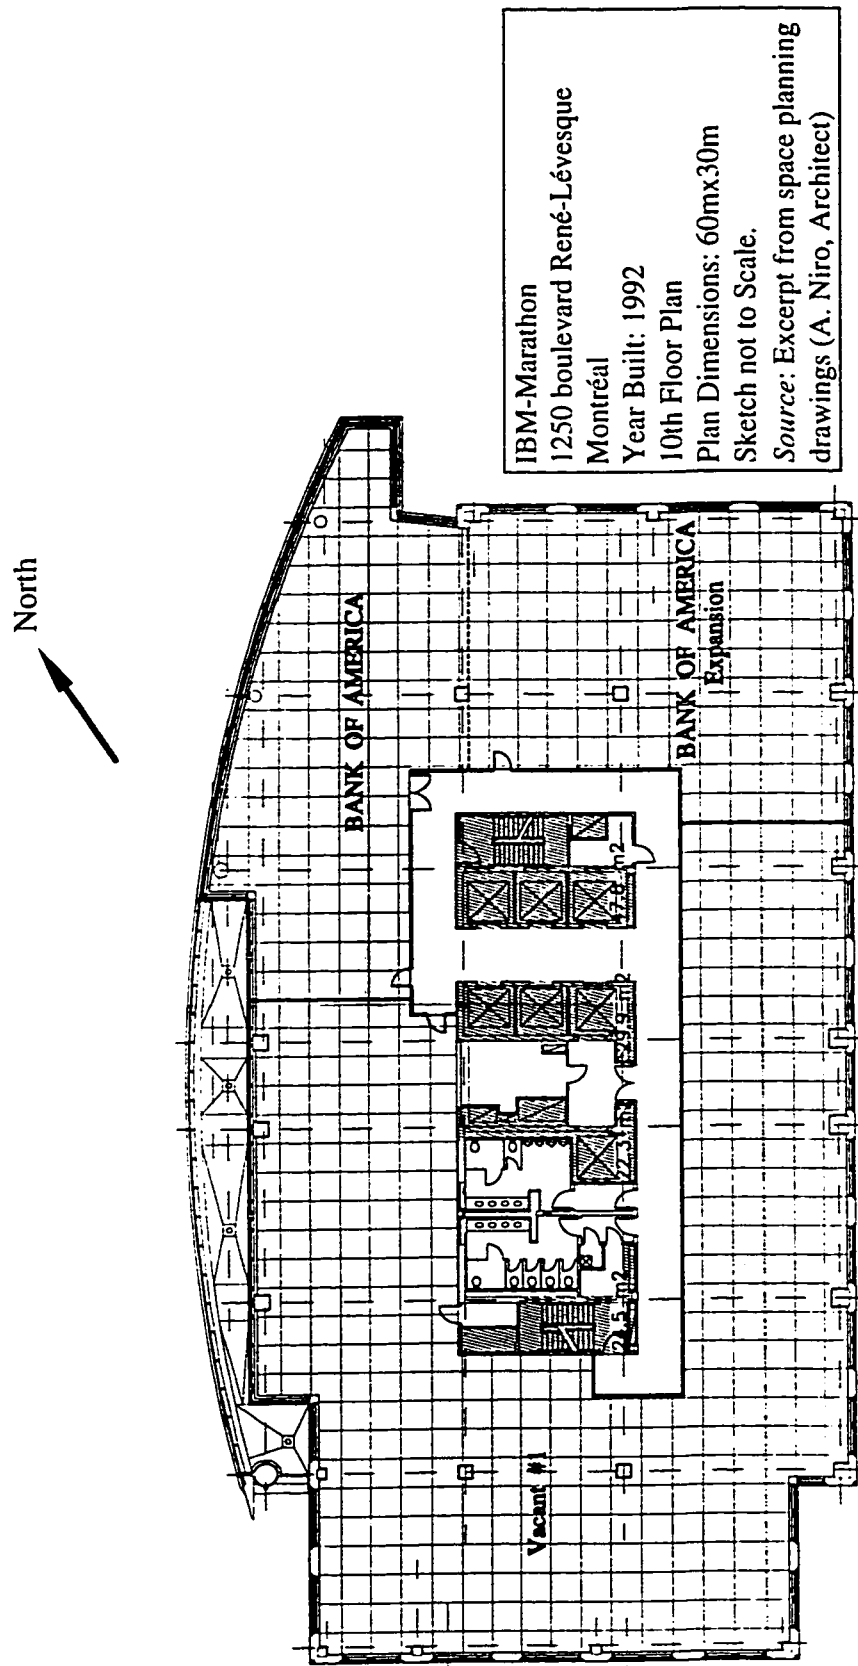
Typical floor plan of building in Design Case 2: IBM-Marathon building.
